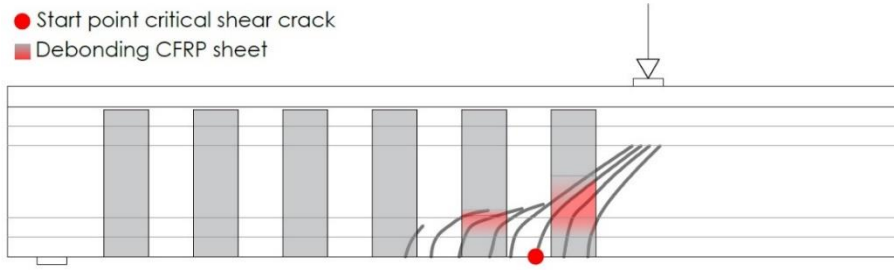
Debonding CFRP sheets specimen I-V-SP4 at load step 50
